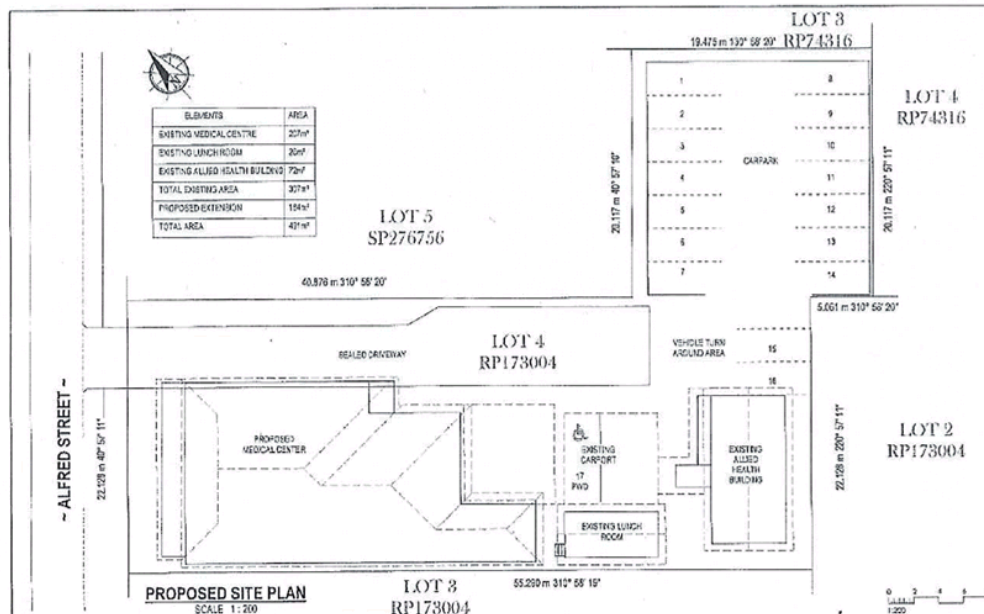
Submitters house [redacted] located on [redacted] of proposed site plan. Note absence of setback dimensions on proposed plan.
